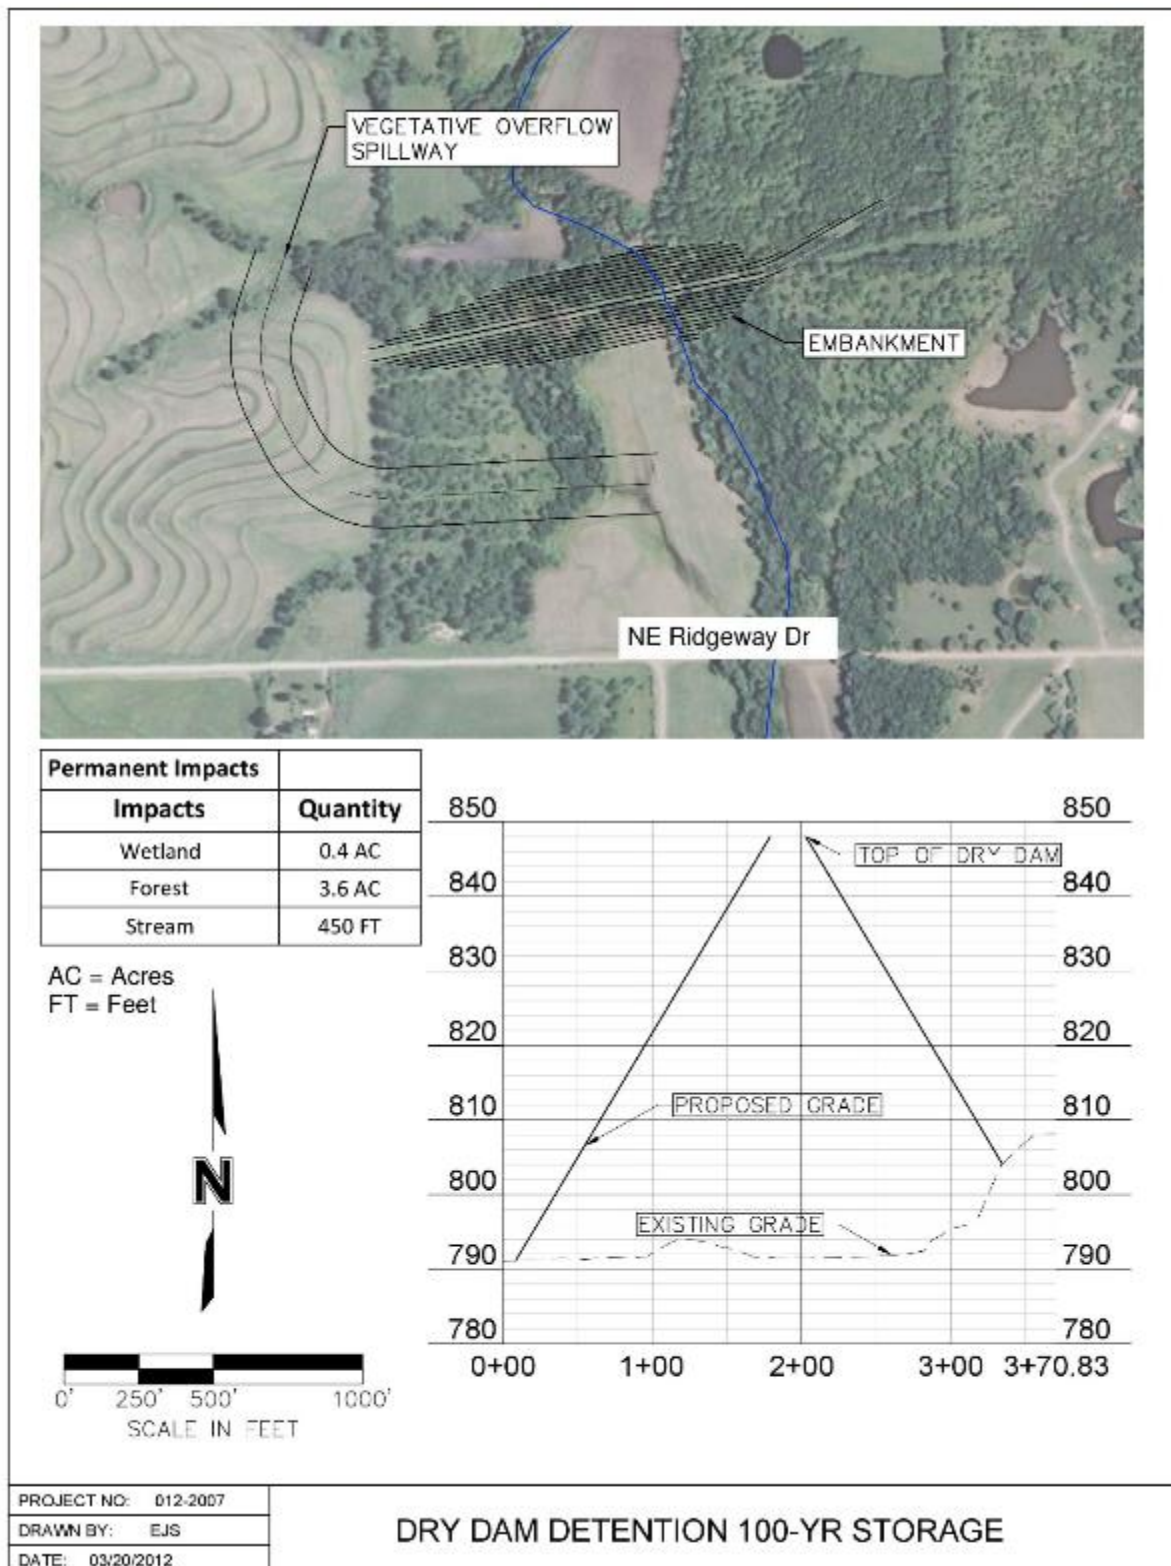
Dry Dam Detention 100-year Storage.
